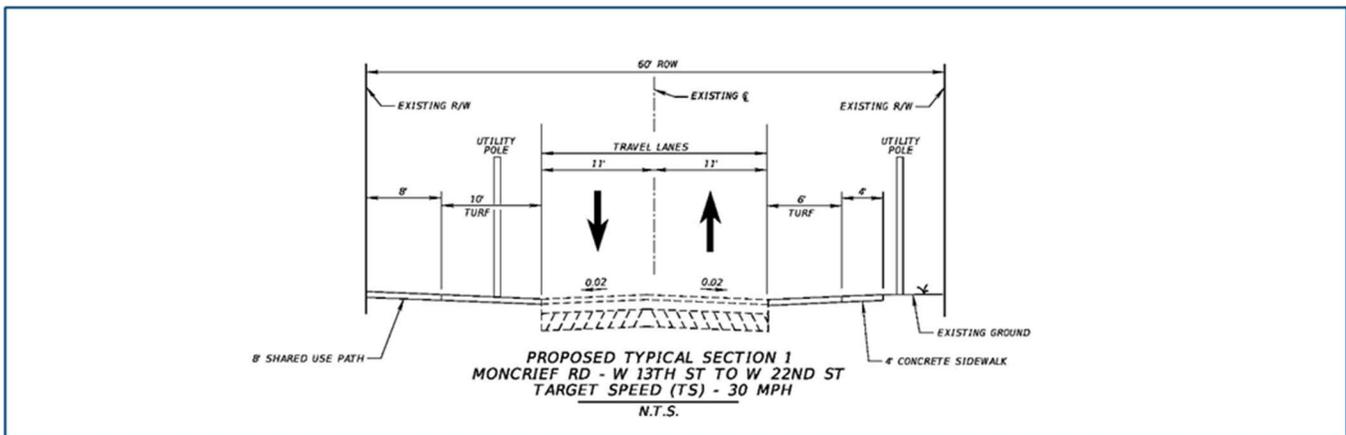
Proposed Typical Section (13th Street to MLK Parkway)
